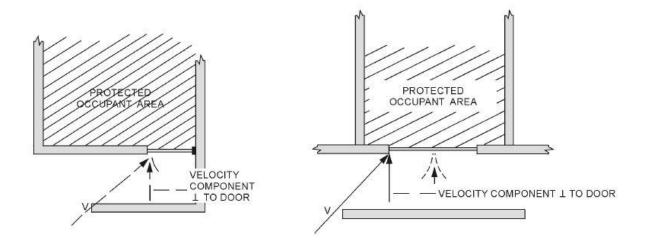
804.9.7.3 DOORS DOOR ASSEMBLY SUBJECT TO FIRST IMPACT
